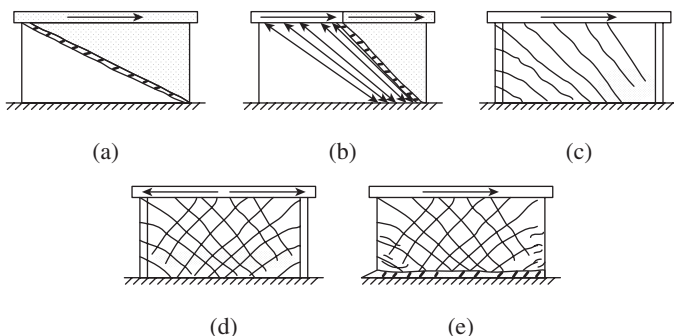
Shear failure modes of squat structural walls (a) and (b) Diagonal tension (c) and (d) Diagonal compression (e) Sliding shear
